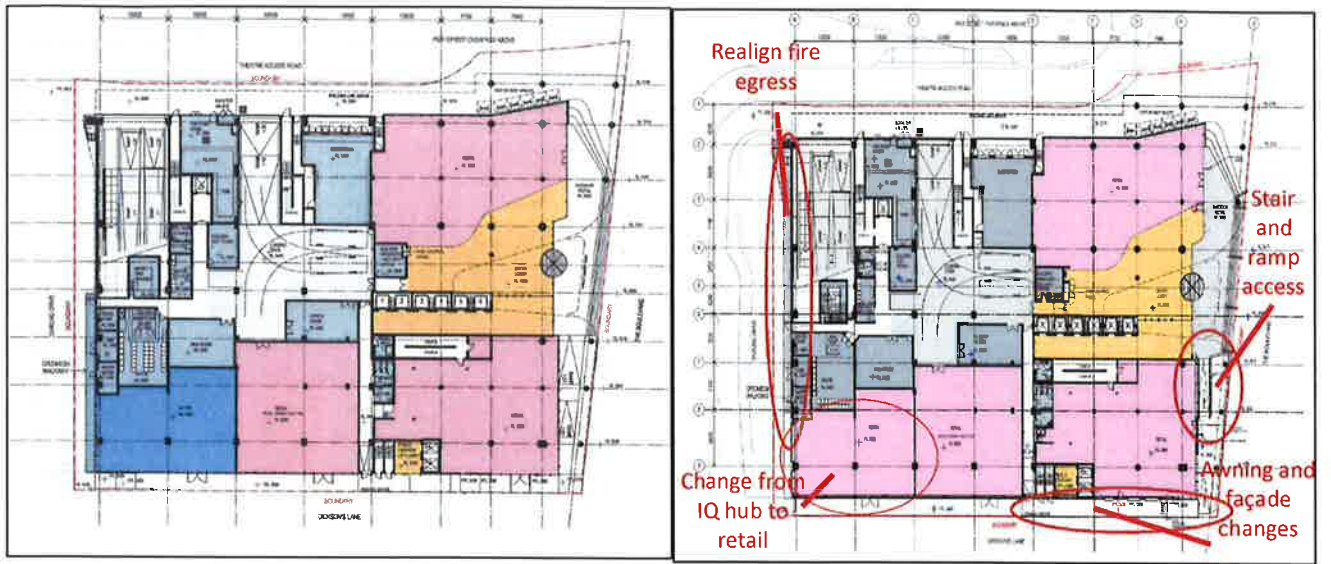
Comparison of approved (left) and proposed (right) ground floor layout. Source: applicant's EIS.
